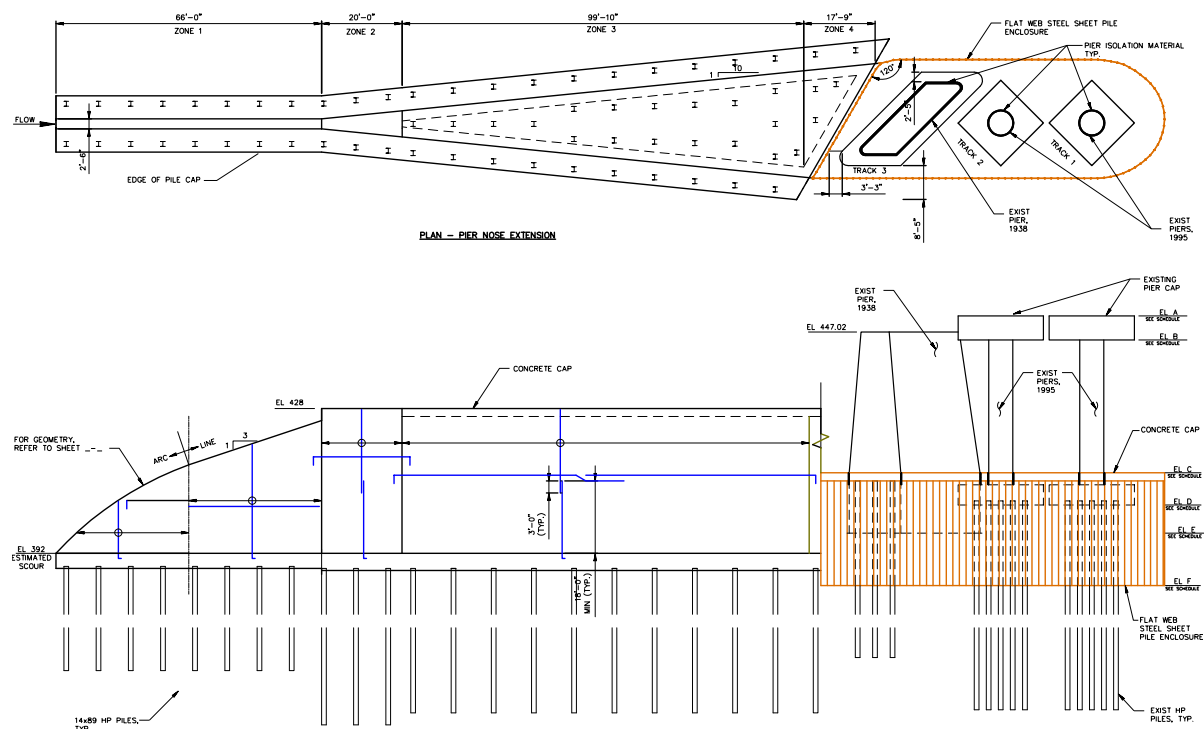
Originally proposed bridge pier extension configuration – top and side views
